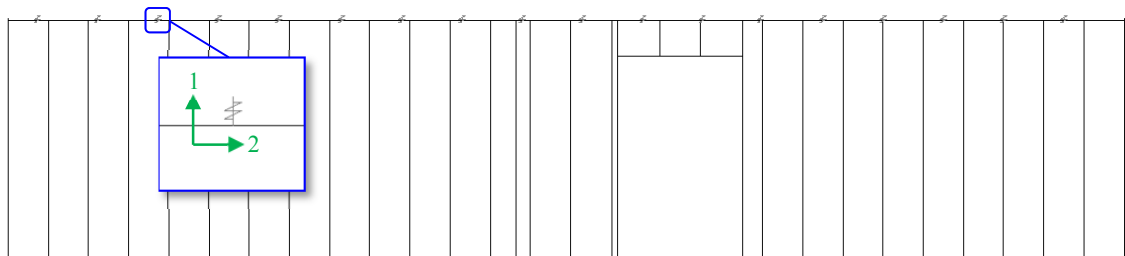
2-Joint Links used to Connect Wall 3 to Truss Bottom Chords – U2
